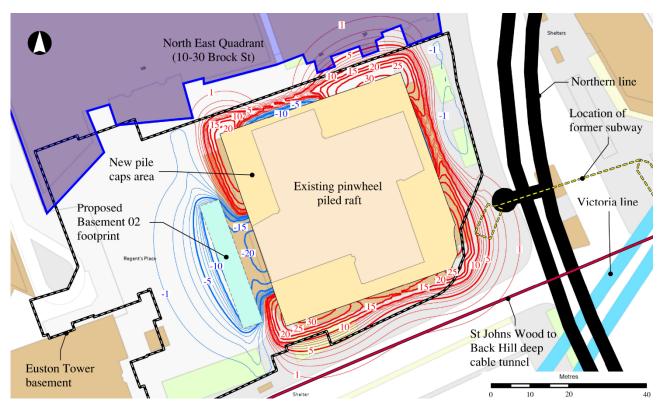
Calculated long term ground movement (mm) at basement level +21.6mOD resulting from partial superstructure deconstruction, proposed Basement 02 excavation, B1 slab lowering and new superstructure loading (downward movements are presented as +ve).
